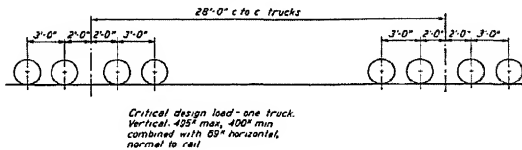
Gantry crane loading for powerhouse wall design.
